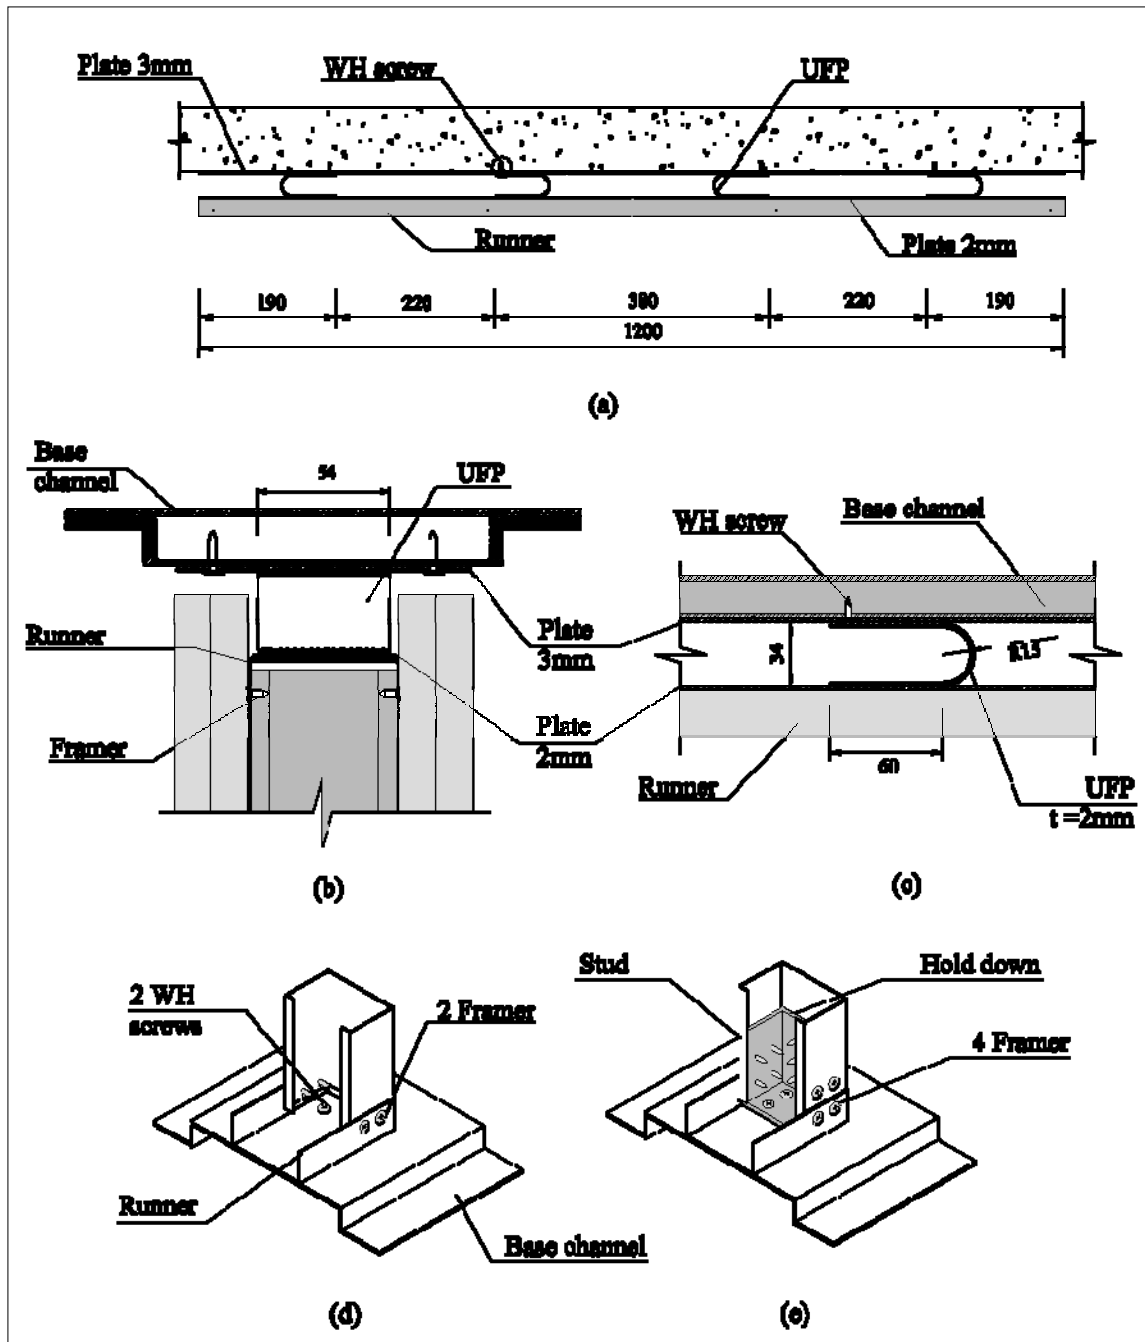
DR details: (a) general elevation when attached to concrete slab, (b) lateral section when mounted on the wall and installed in the testing frame, and (c) front detail of DR. Details of bottom anchoring of outer studs of EDPWs: (d) EDPW2, and (e) EDPW3.
